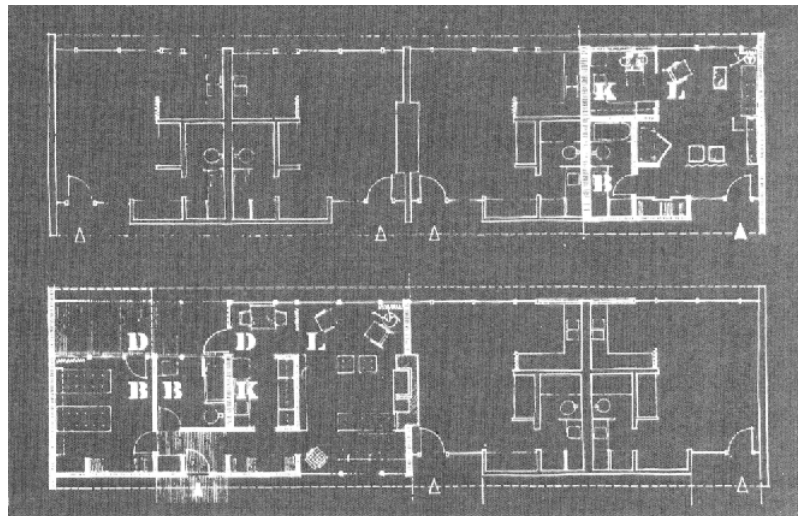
Original plans - 1st floor on top, 2nd floor on bottom
